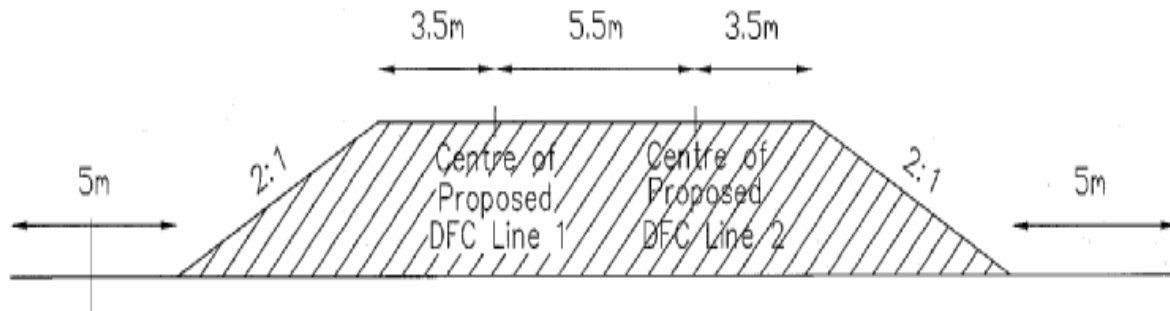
Typical Section in Filling for Track on Diverted Portion
